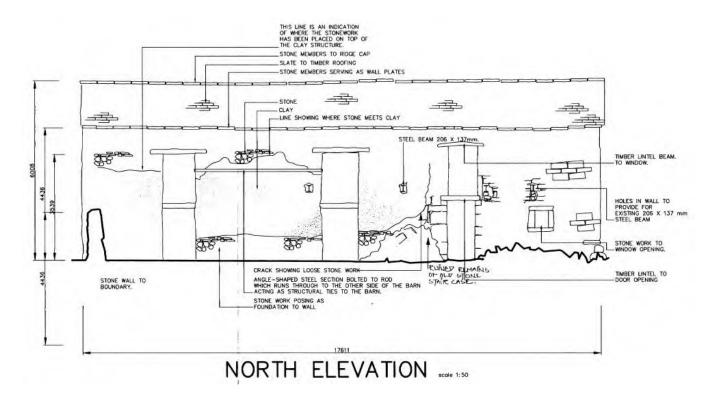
Northern Elevation survey drawing showing original front elevation of the barn showing the extent of the clay daubin structure. Western end (right-hand side) from the right-most set of bay doors is .sand stone construction.
